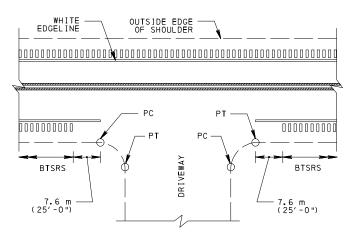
TYPICAL DRIVEWAY SEE NOTE 7
